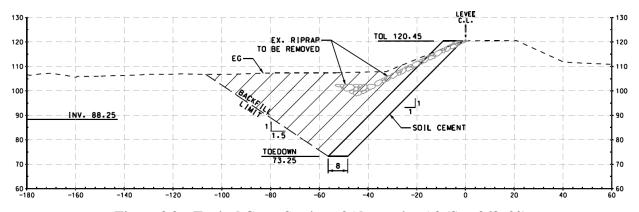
Typical Cross Section of Alternative A3 (Sta. 368+00)
